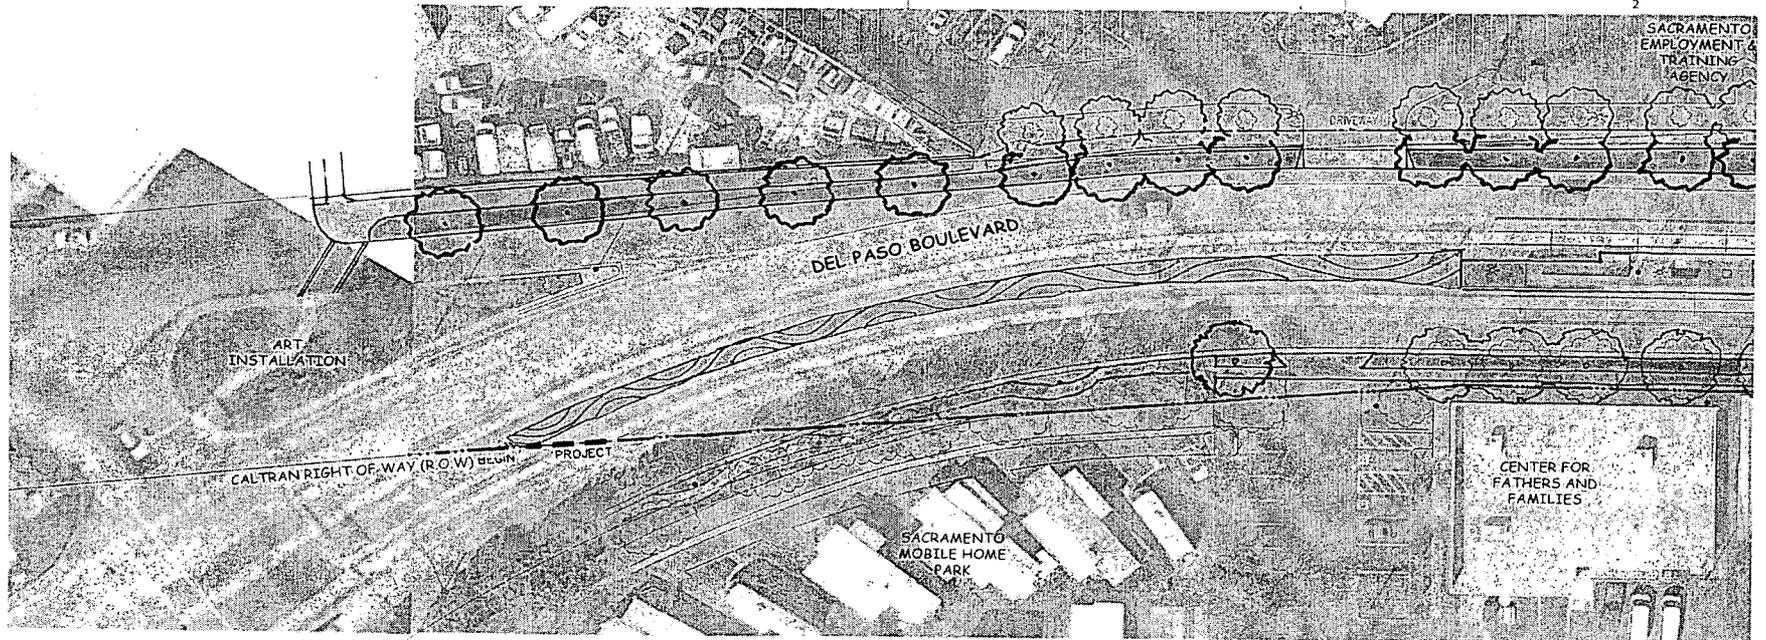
% Design Plans – Globe Avenue RT Station to Barstow Street
